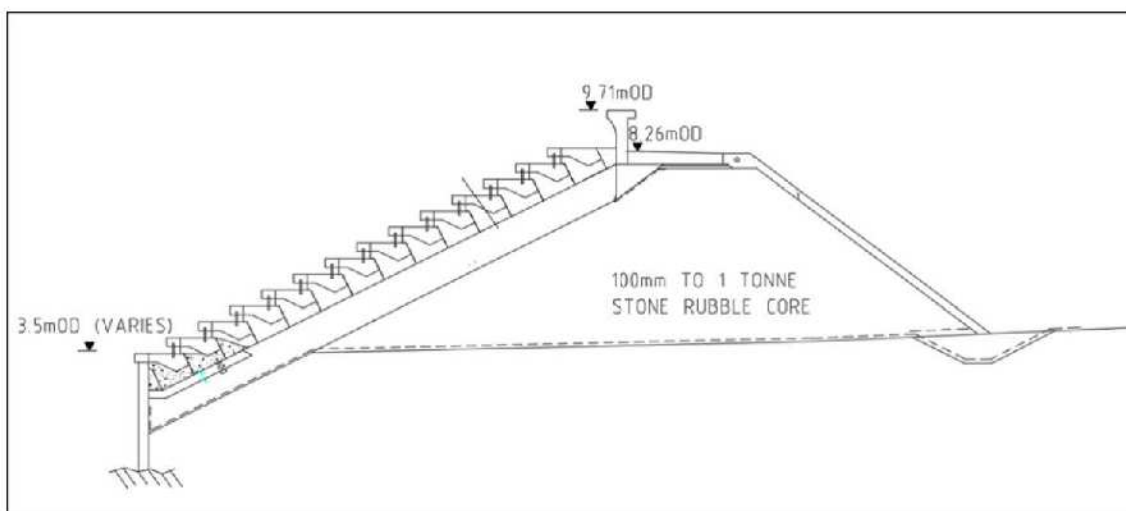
Section-4 (Terrace Blocks) – Typical Structural Details (not to scale).
